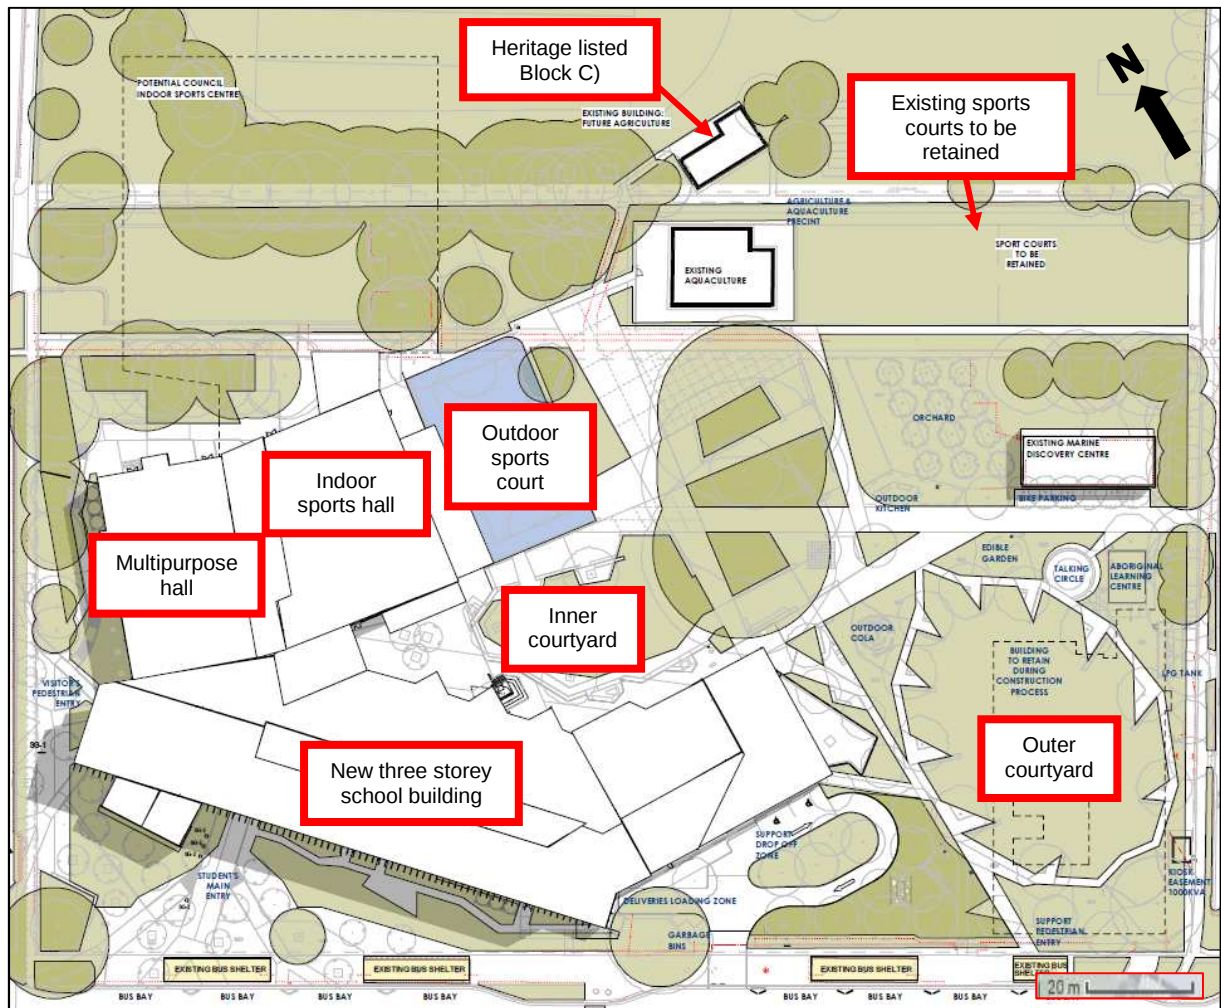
Proposed Site Layout Plan (Source: Applicant's RtS)
